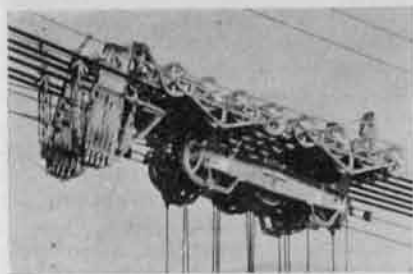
The carriage rides the six-track cables on 48 wheels. Besides the track wheels there are enough line sheaves in this rig to provide a 16-part 1/8-in. line for hoisting 150-ton loads.
